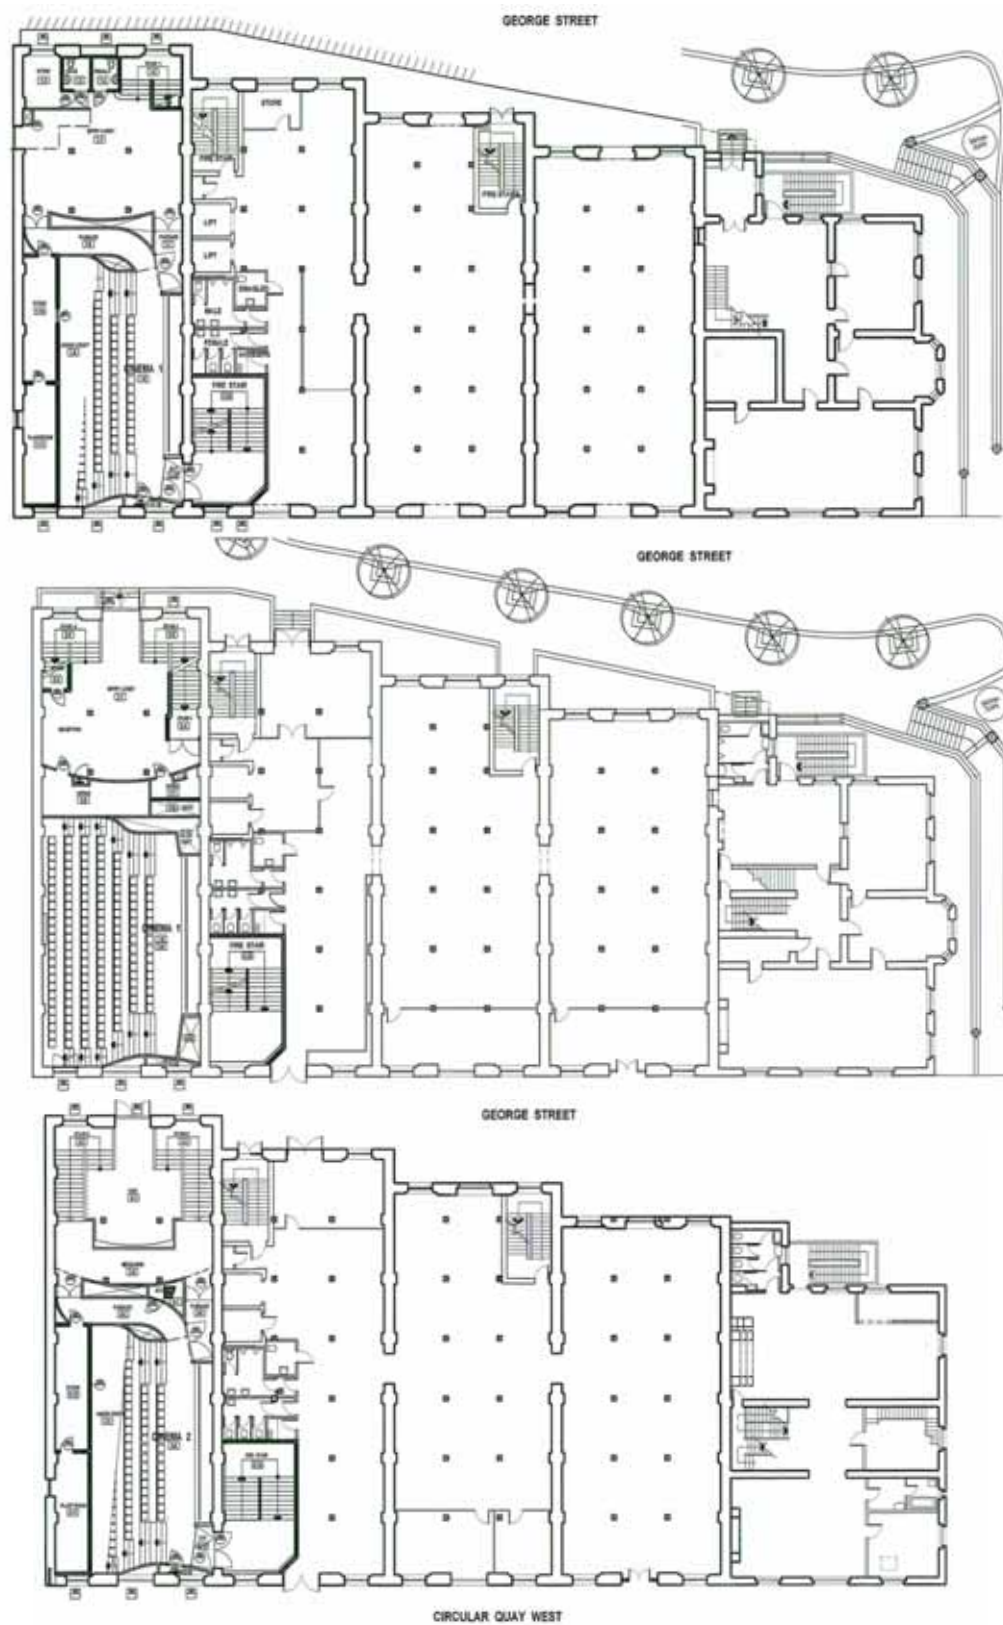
2008 First, Second & Third Floor layouts of the ASN Co. Building reproduced from the measured drawings dated 26/02/04.
